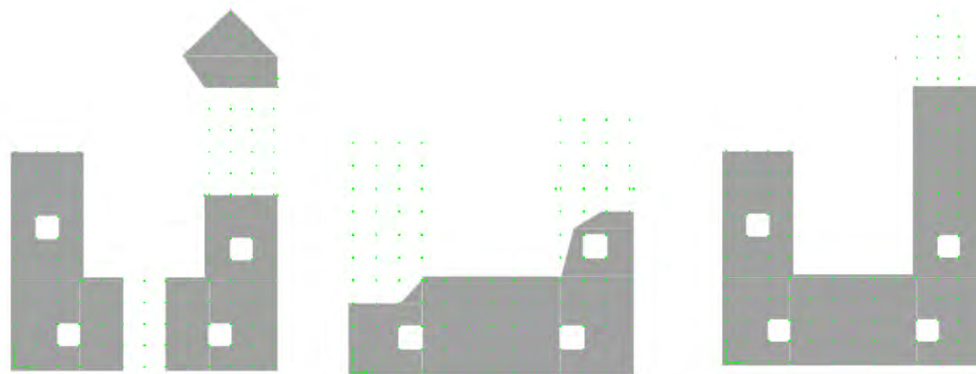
Left to right: 1st Floor, 2nd Floor, and Roof Slab
